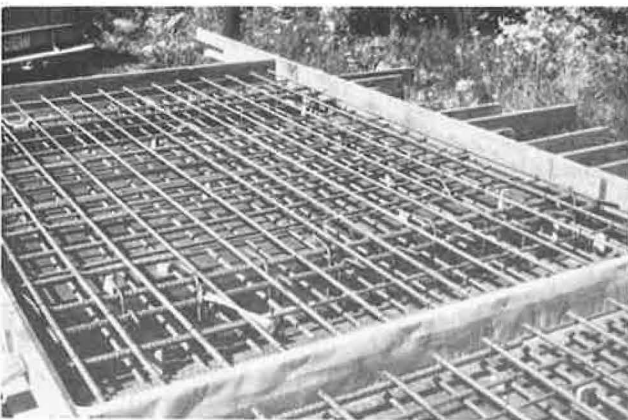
Slab reinforcement (deepened sections represent prestressed, precast concrete girders).
